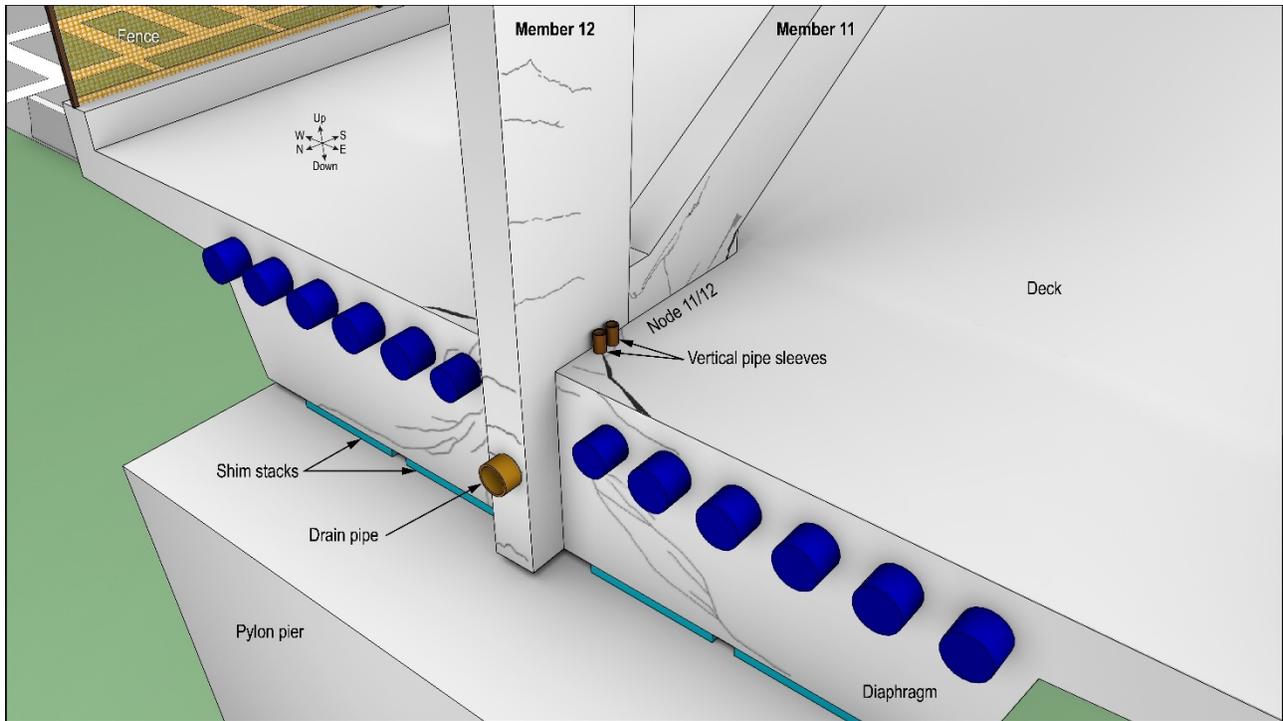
South and west view of extent of cracking at member 11/12 nodal region, deck, and diaphragm, indicating structural distress.
